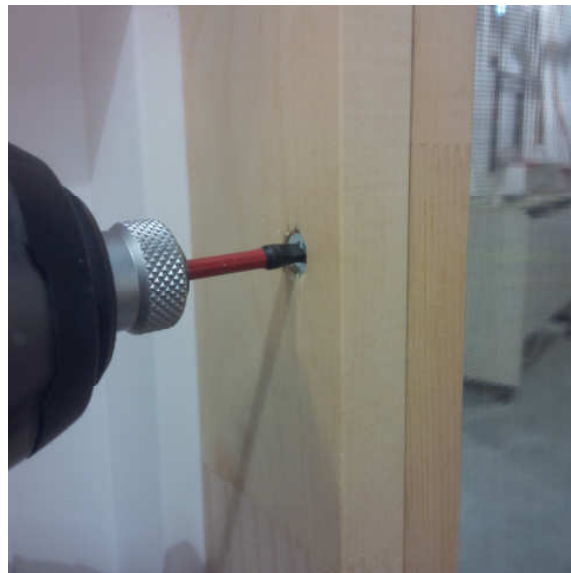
Slightly bury screw head so that wood filler can fully conceal fastener at time of painting. Do not bury screw head enough that the tip protrudes through the other side of the wood.
